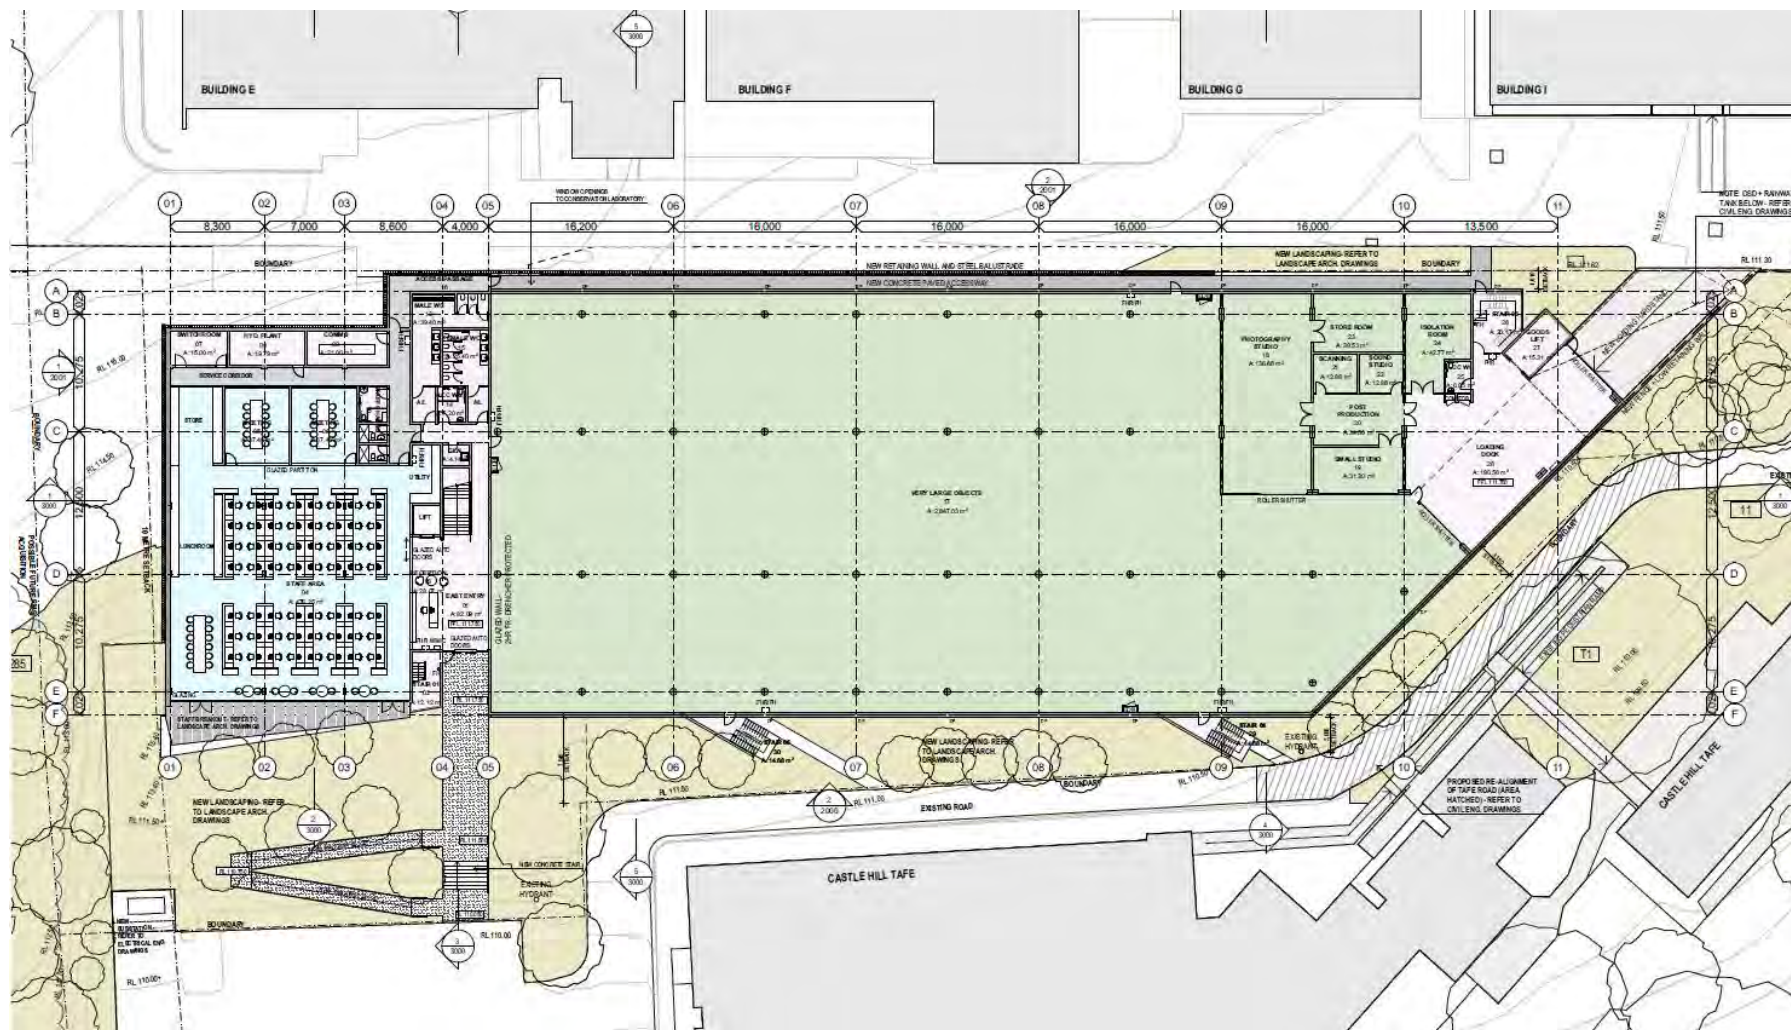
Lower Ground Floor Plan (Lahnimmo Architects, DA1400, Rev.12, 7.08.2020)
